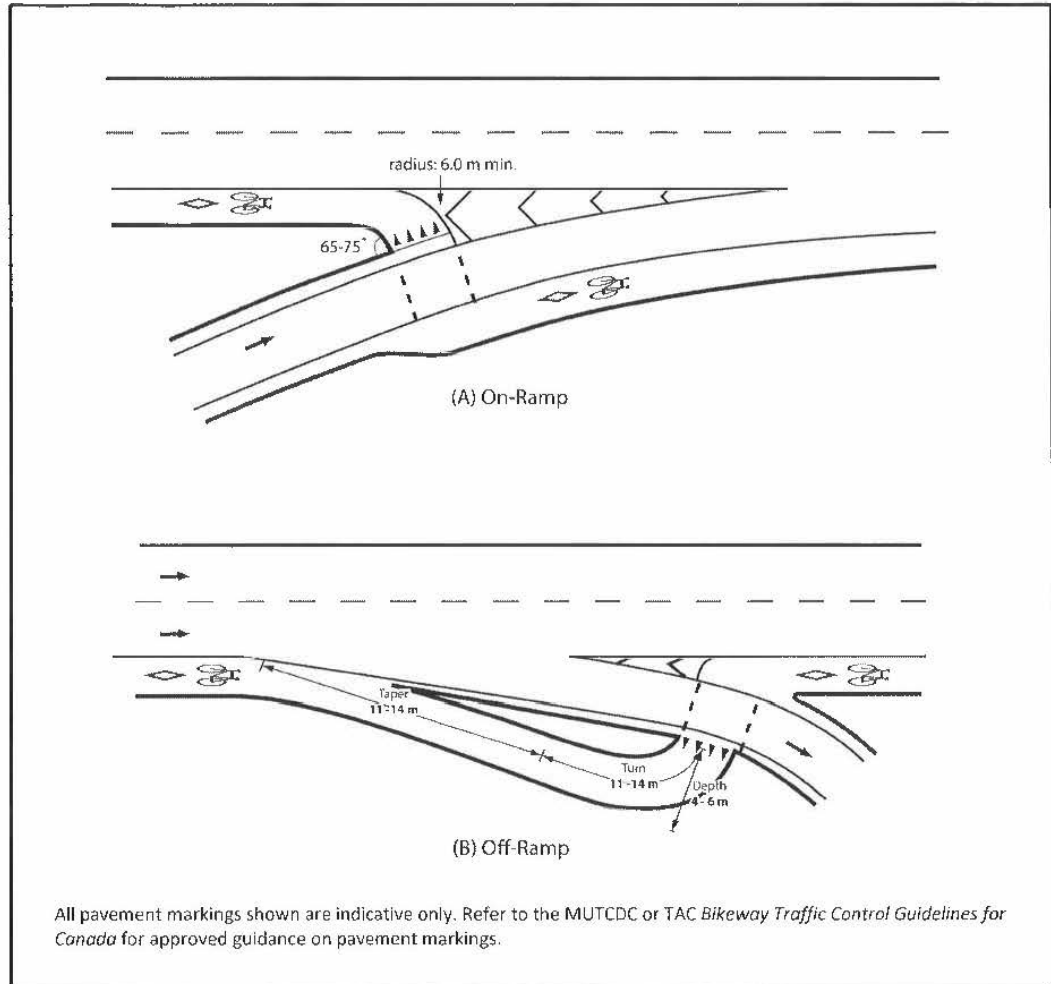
Bikeway Crossing High-Speed On/Off Ramps
